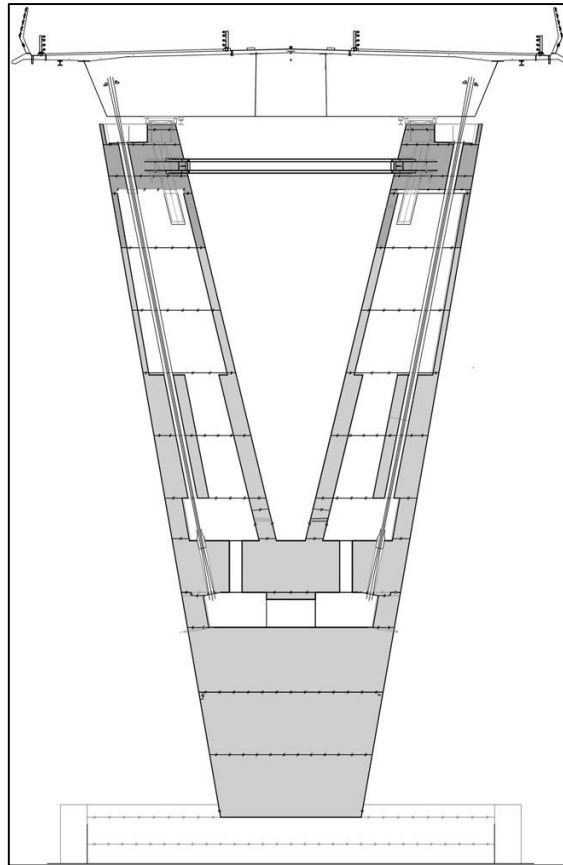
V-shaped piers layout (Romberg, et al., 2018)
